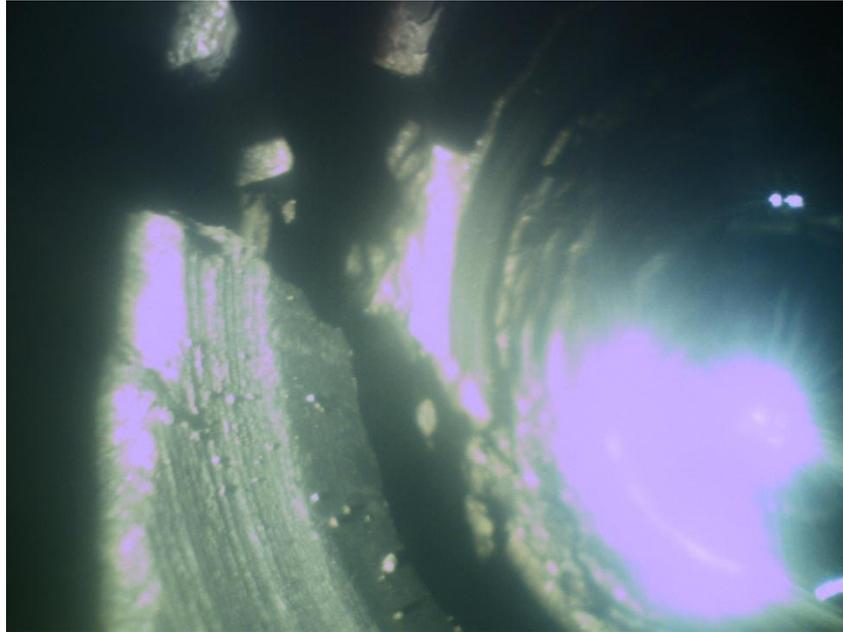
no cracking or fracture of the pier concrete noted inside the corehole
